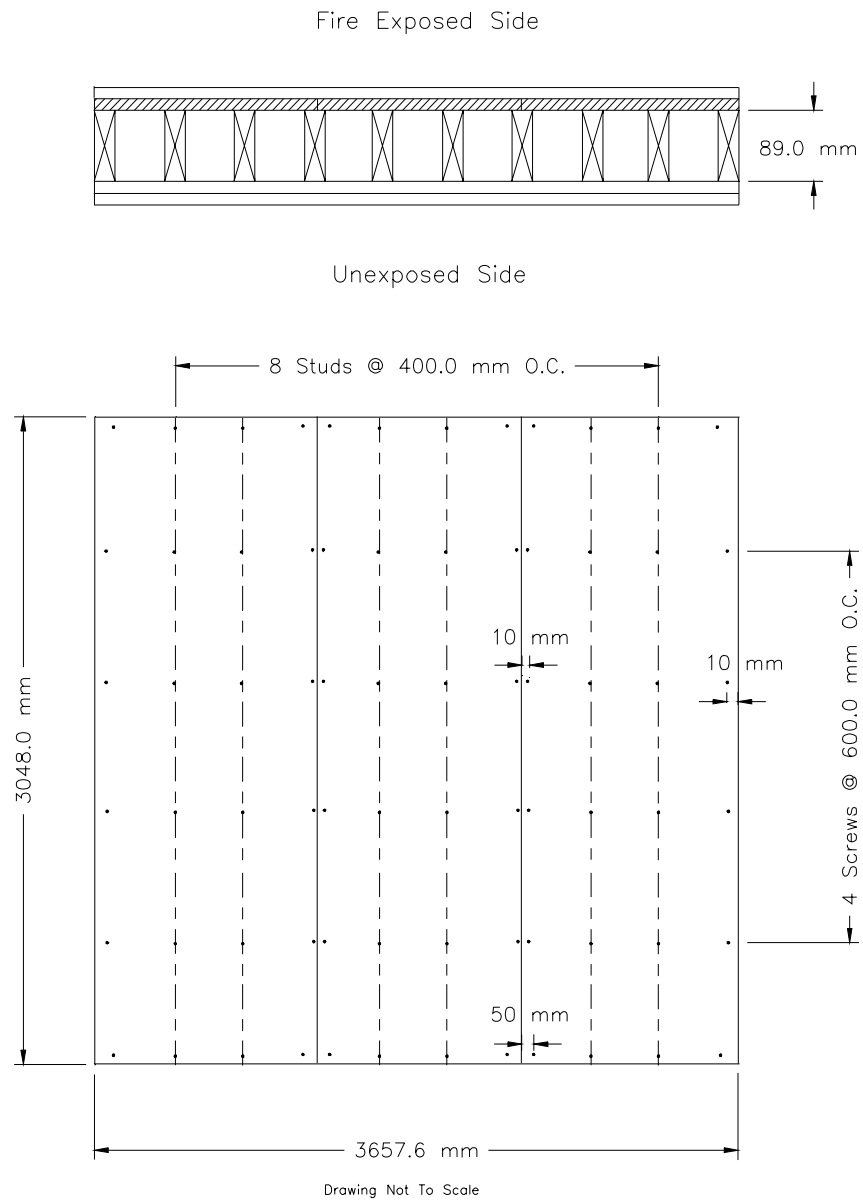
Screw Locations For Wood Stud, 2x2 Gypsum Board Layers, Full Scale Assembly ( Base Layer, Fire Exposed Side)
